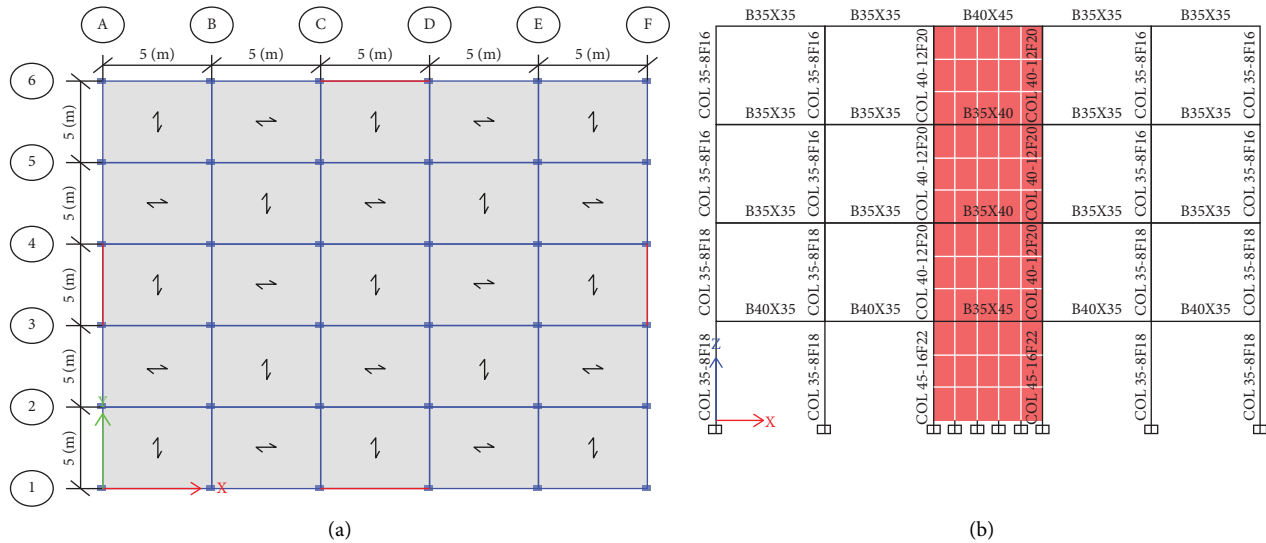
(a) Plan of structural models. (b) 4-story model.
